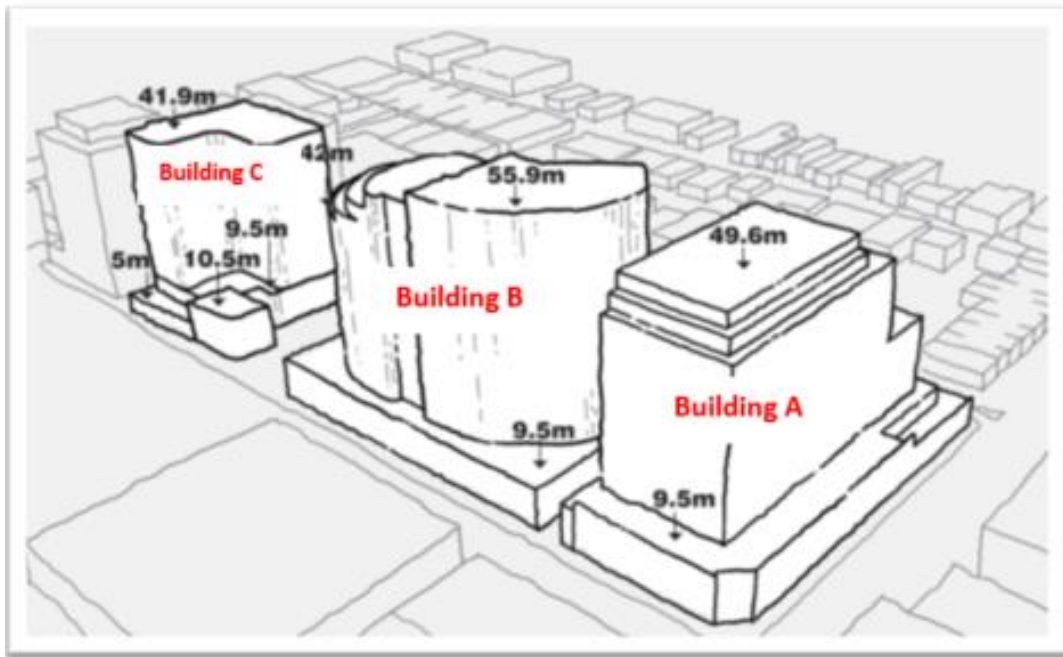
Proposed massing of buildings viewed from north-west. Source: Development Plan (Gurner 2023)
